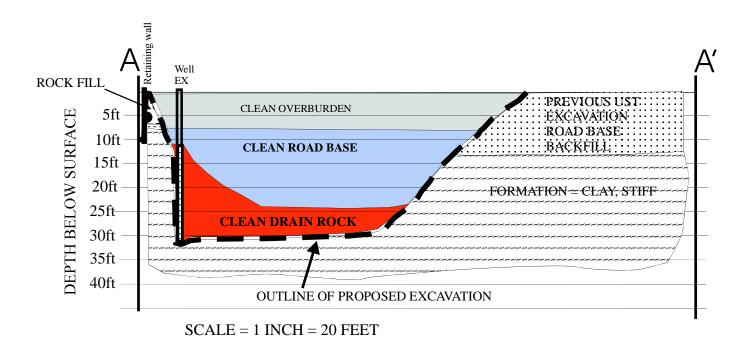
CROSS SECTION A - A' FROM REVISED FIGURE 4.
